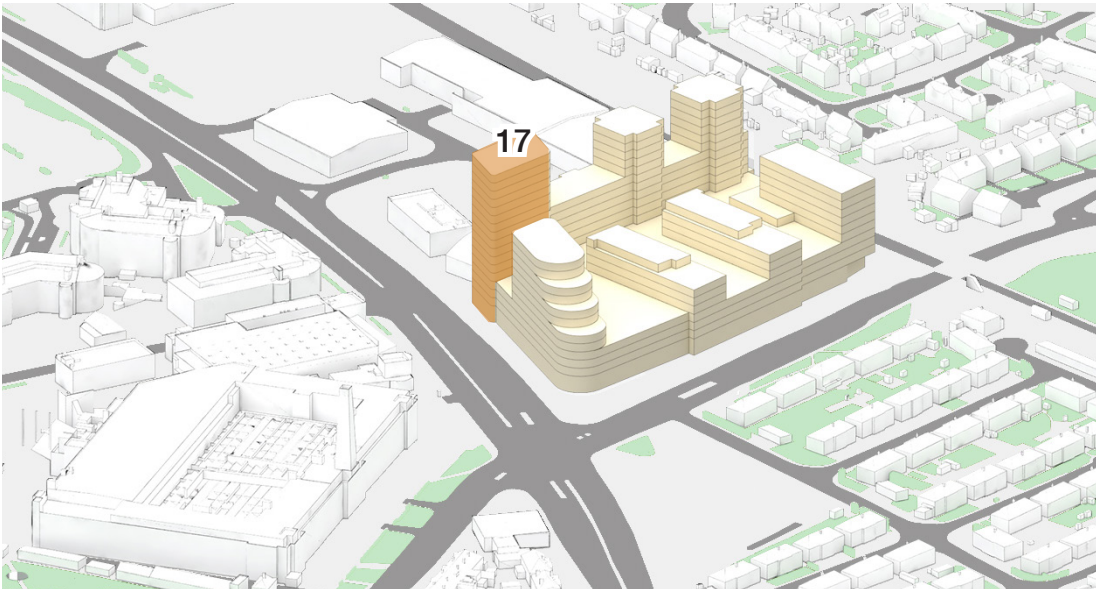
Massing of building B1 - A townscape marker along the Great West Road
